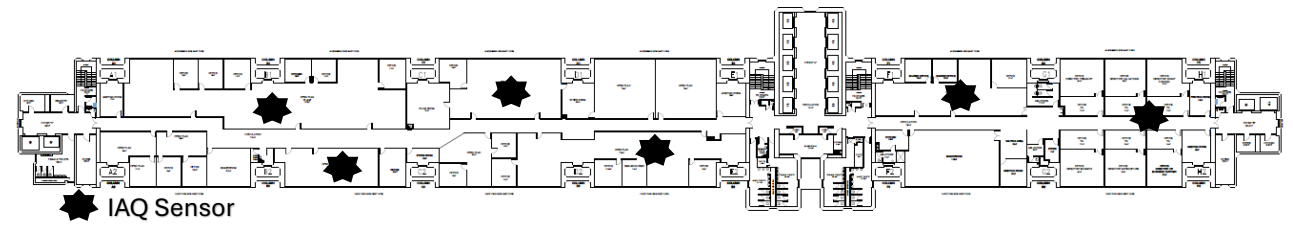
Tower Building proposed sensor positioning 7th floor (6)
